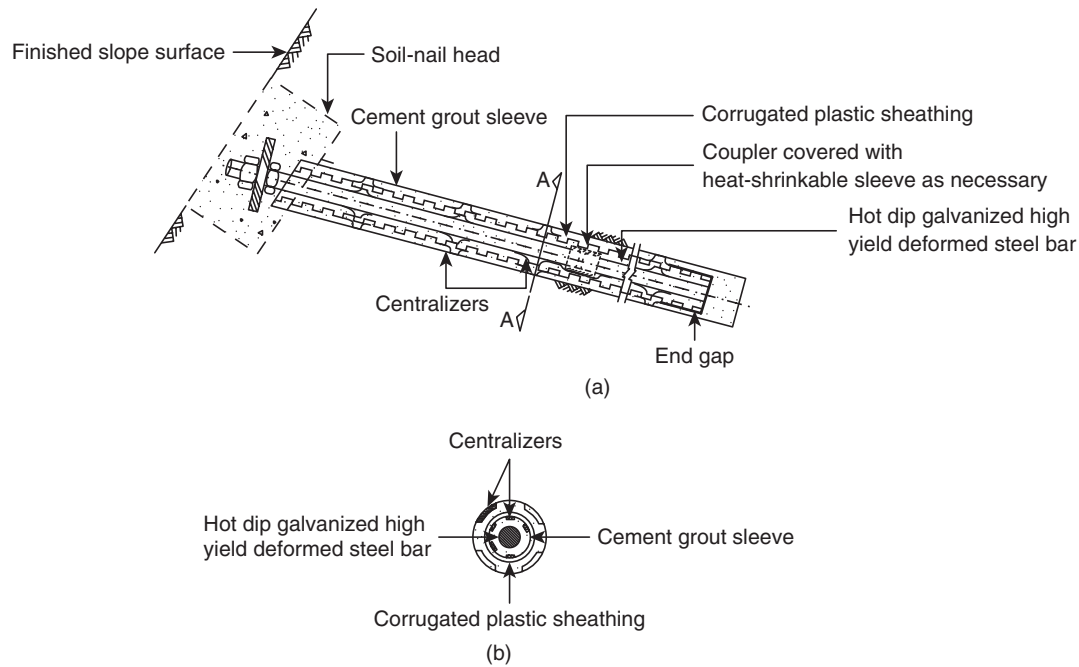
Grouted soil nail wall: (a) Cross section and (b) soil nail with centralizers. (After Prashant and Mukharjee, 2010)
